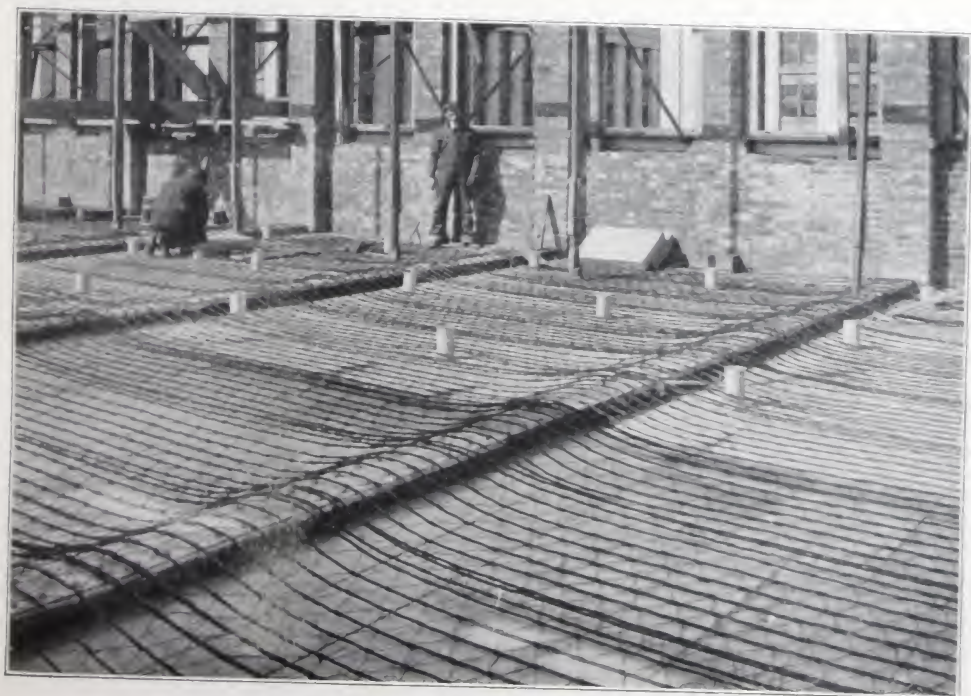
Closer detailed view of the reinforcement shown in Fig. 24.
